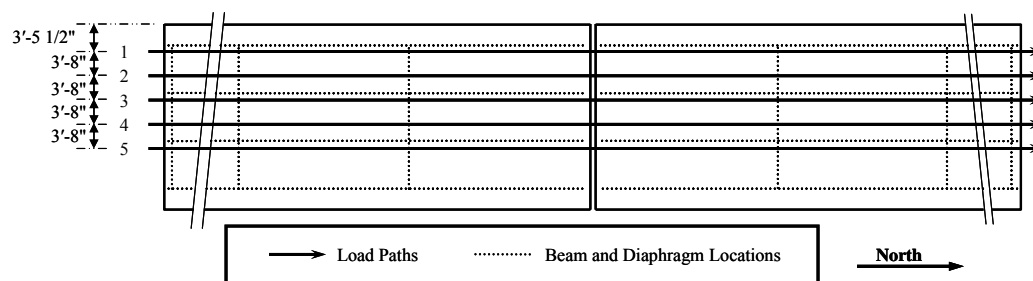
Plan of Loading Paths for Lampasas River Load Tests
